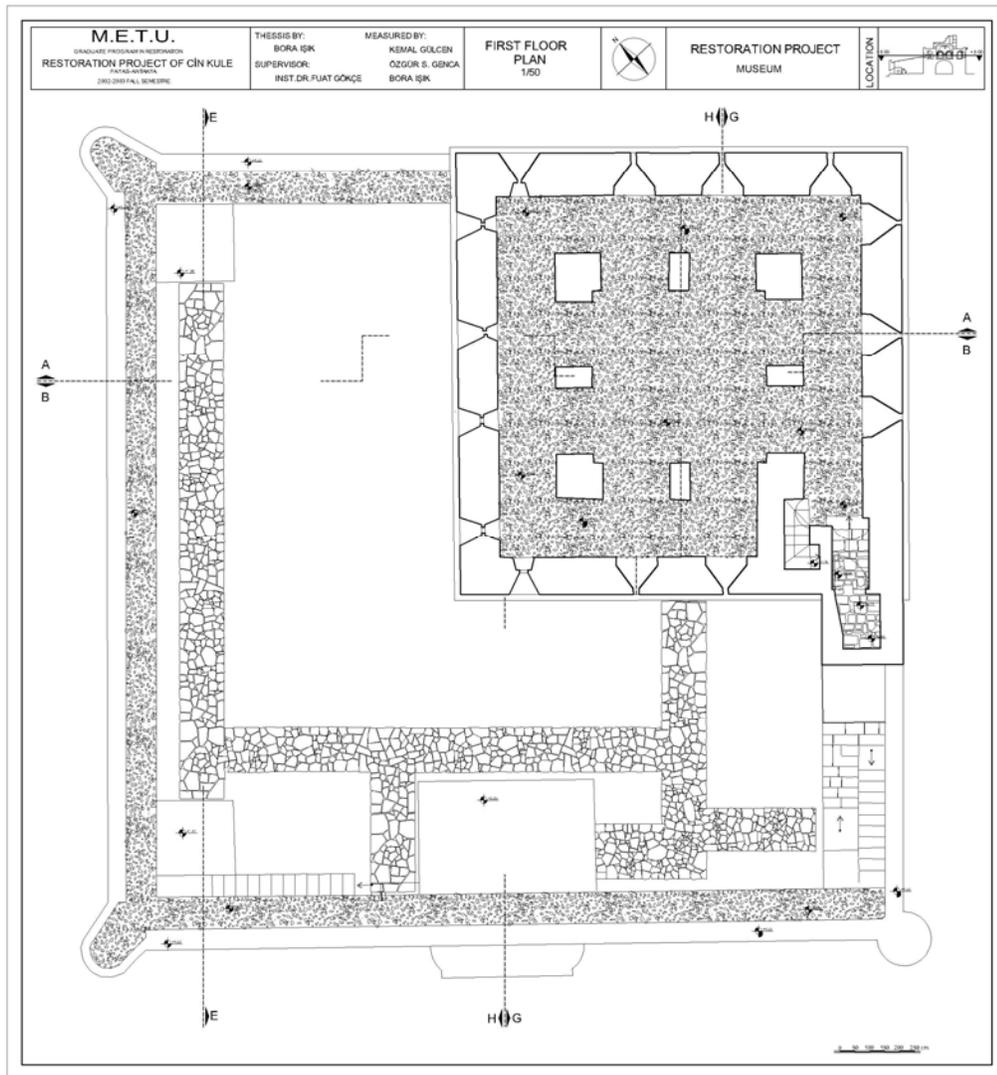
Restoration Project- 1<sup>st</sup> Floor Plan.
